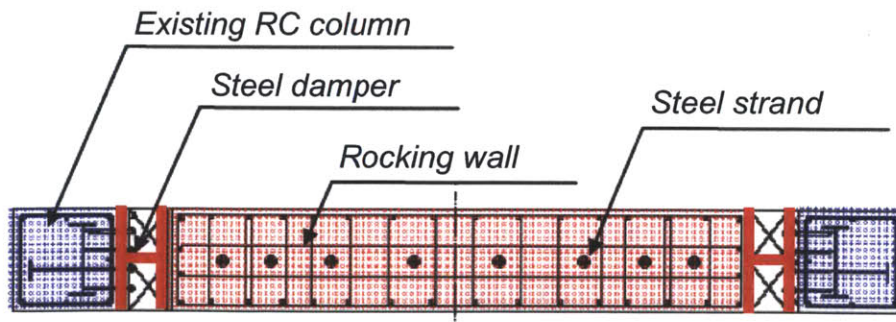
Cross-section of a rocking wall.^{32(adapted)}
